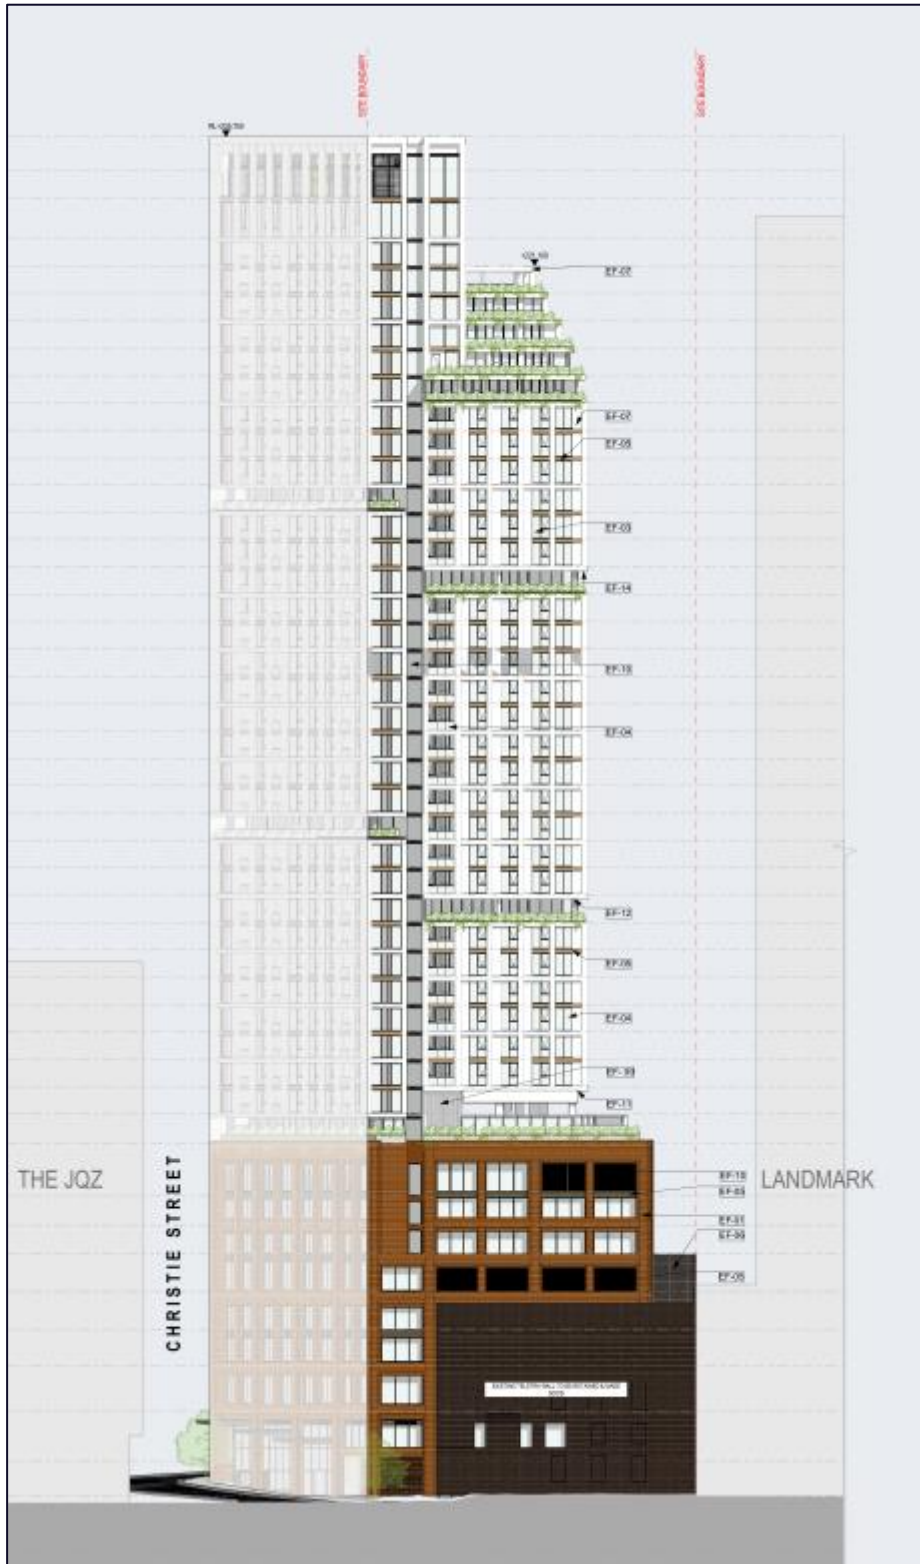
Proposed Façade of 524-534 Pacific Highway (DKO Architecture, 2023)
